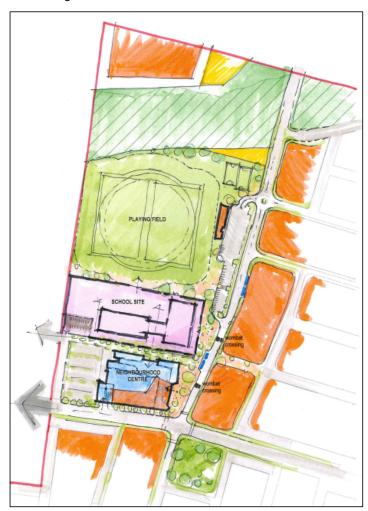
Indicative Layout Plan for neighbourhood centre, school and playing fields
